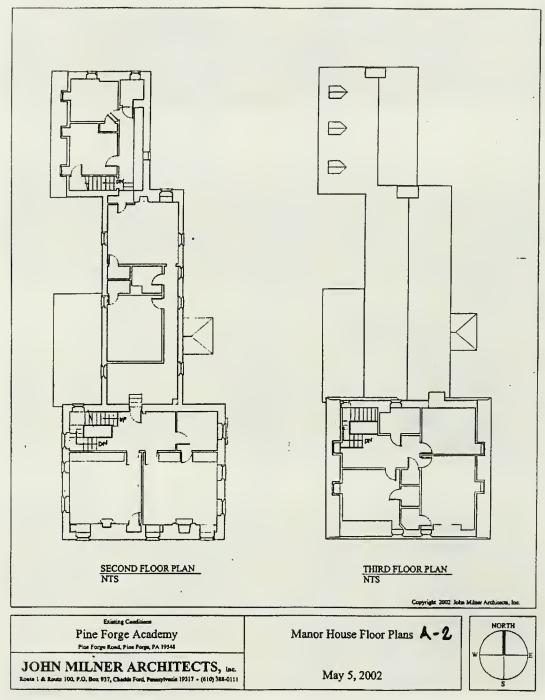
Manor House, Second and Third Floor Plans, 2002
